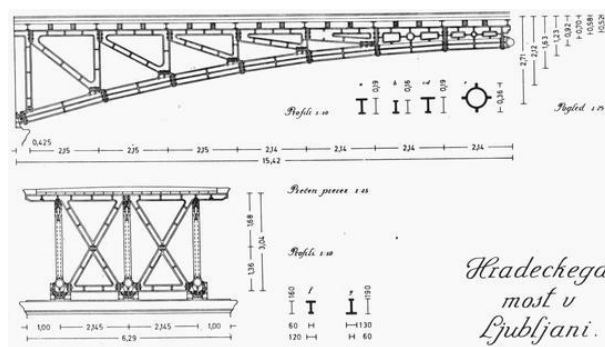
The detailed plan of the new bridge: the front elevation of one cantilever and the cross section [Kurent,1983].
